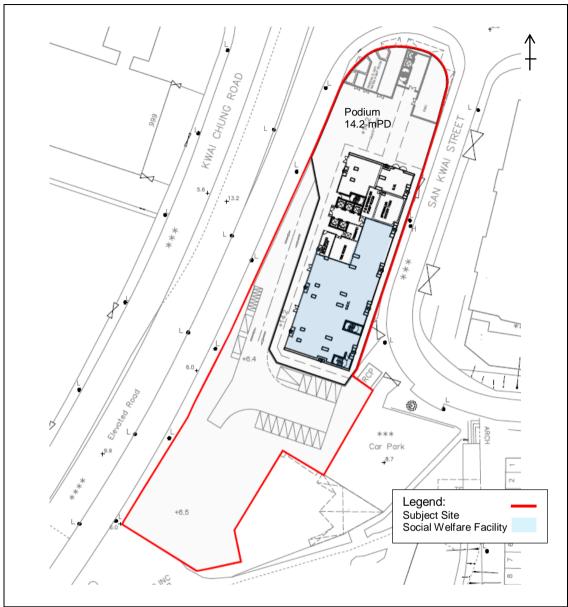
Site Layout Plan – Podium (Social Welfare Facility)
